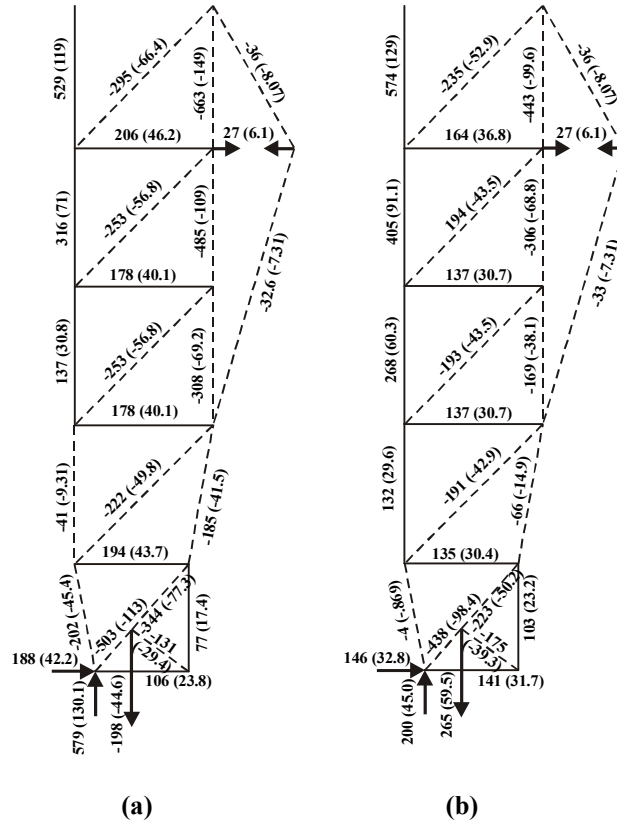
Strut-and-tie model Results for Short Columns (a) West Column Internal Forces (b) East Column Internal Forces
